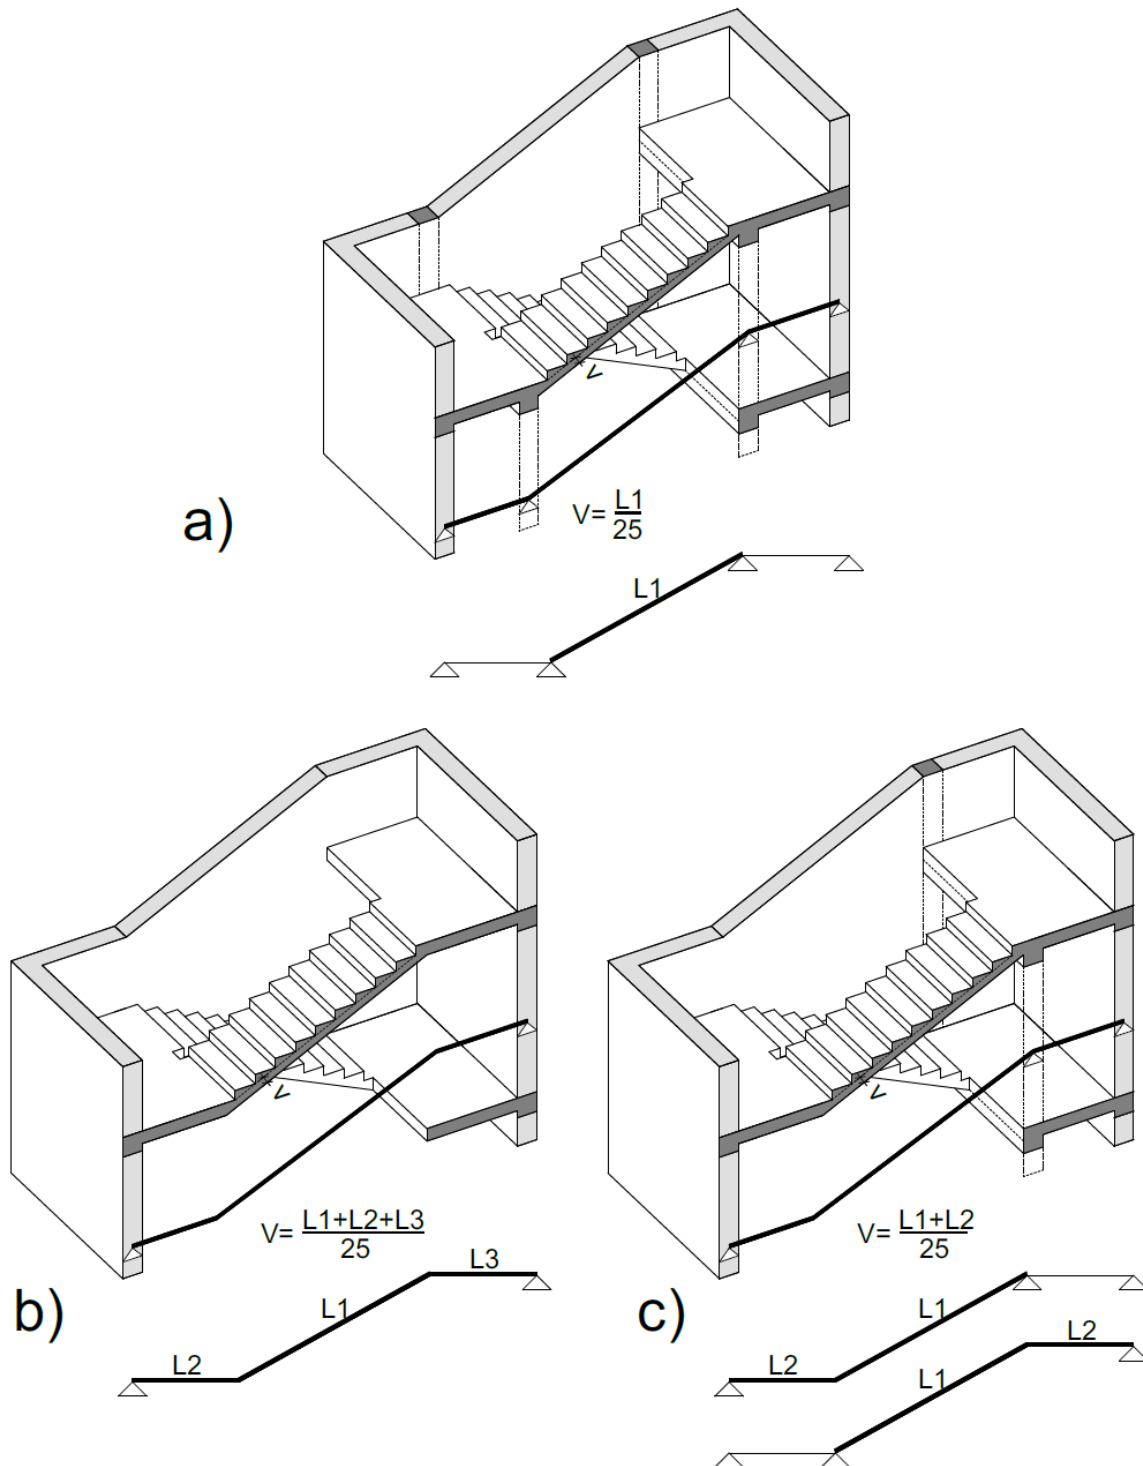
a) single span waist slab, b) double folded waist slab, c) single folded waist slab
